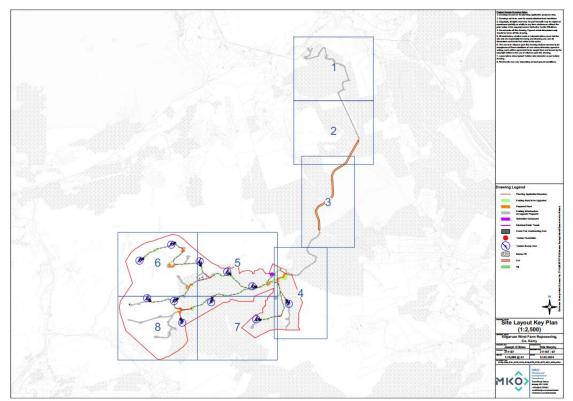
Site Layout Key Plan (Dwg no. 211107 - 07), Source MKO
